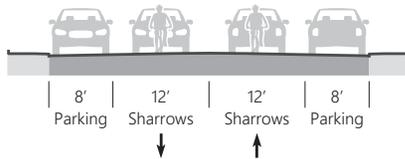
CLARENDON AVENUE, SATURN AVENUE, MIDDLETON STREET, & ARBUTUS AVENUE EXISTING CROSS-SECTION
